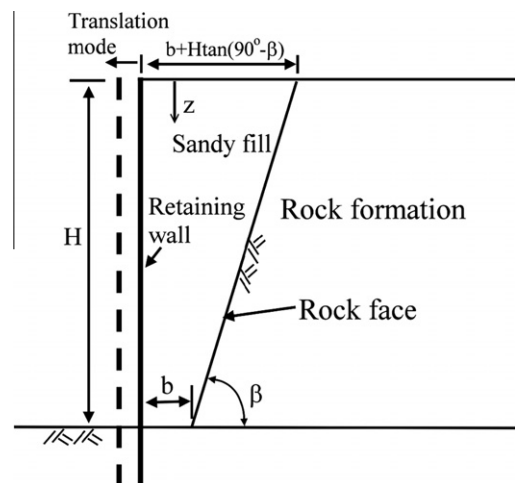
Typical geometry of backfill zone behind a retaining wall and the type of wall movement (translation mode) used in this study.
